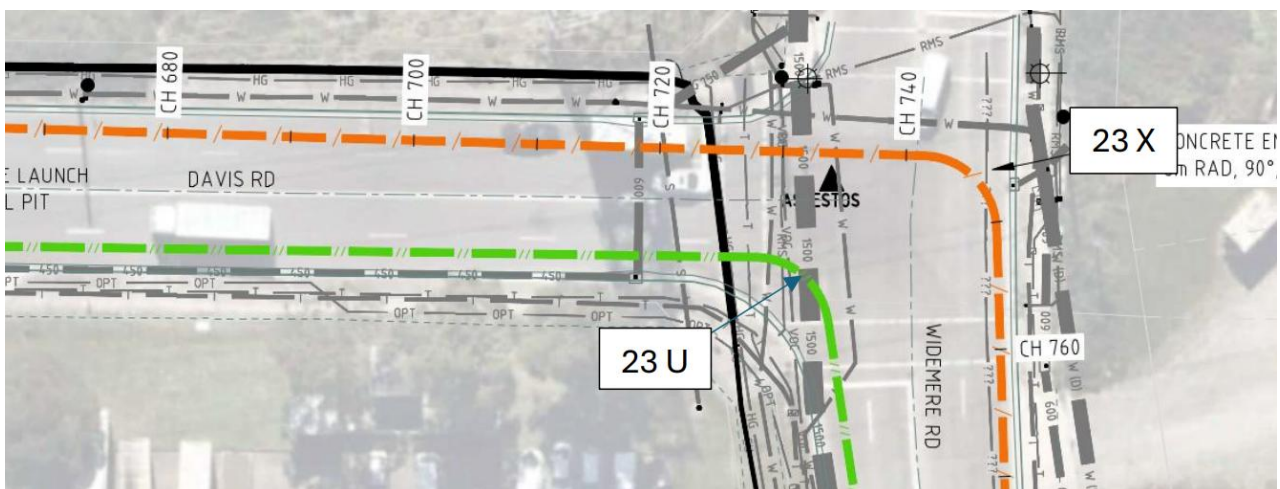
2 feeder cables that are proposed to run through Davis Road and Widemere Road Wetherill Park
